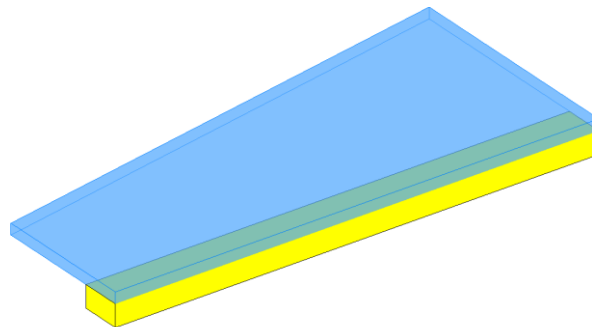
The prior calculation of the intersection between beam and floor is floor volume.
